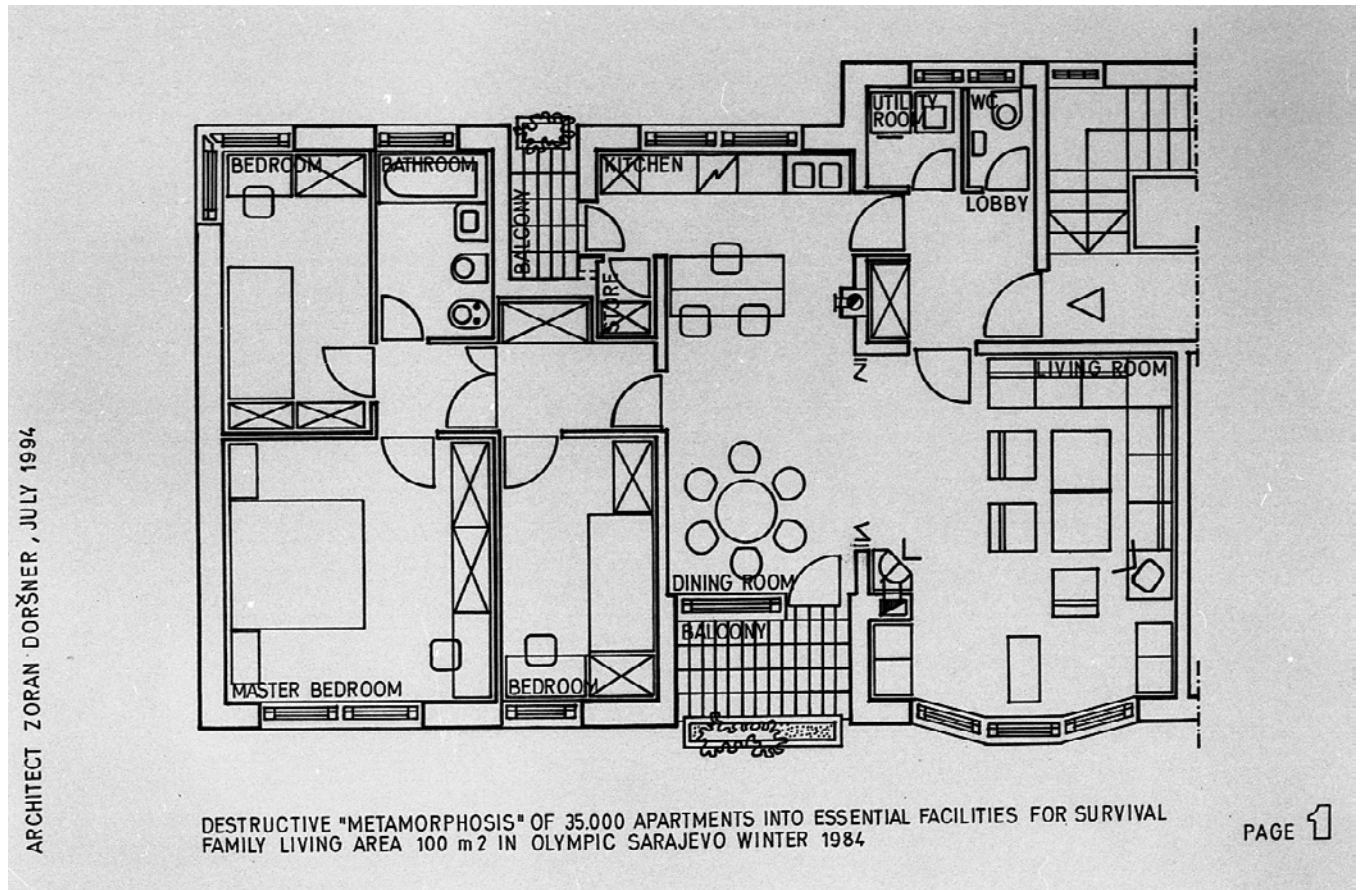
A typical Sarajevo pre-war apartment floorplan; Drawing: Zoran Doršner.
